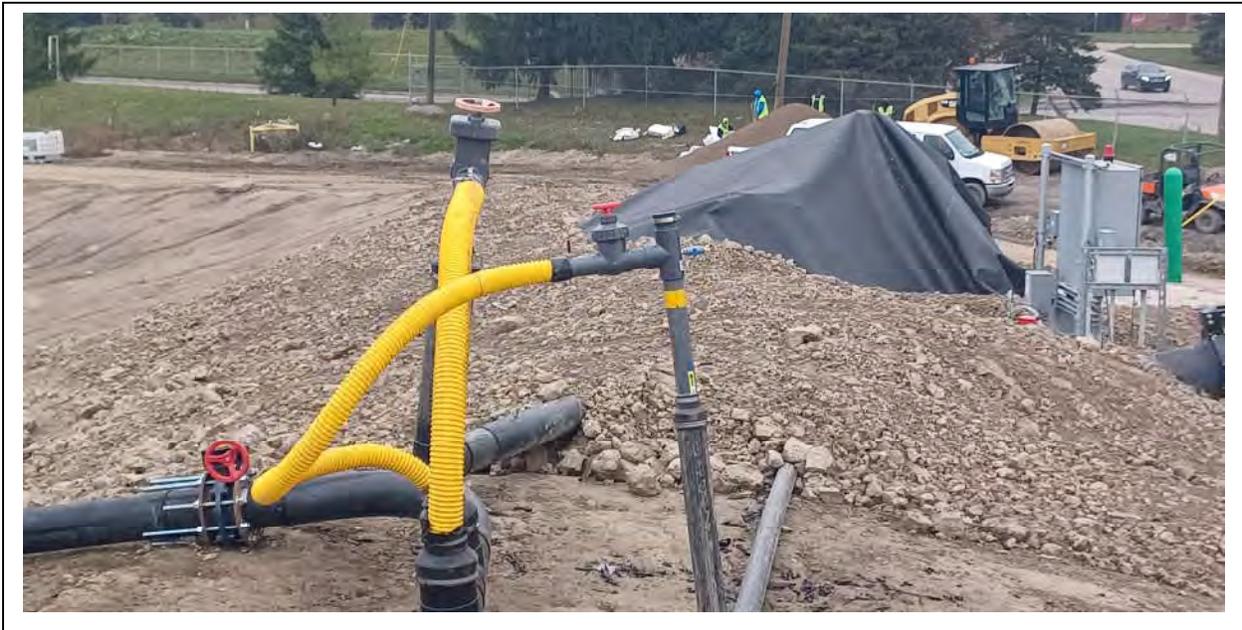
Liner installed over the leachate cleanout risers to address the penetrations. 3-inch vacuum line installed under liner to maintain negative pressure.
